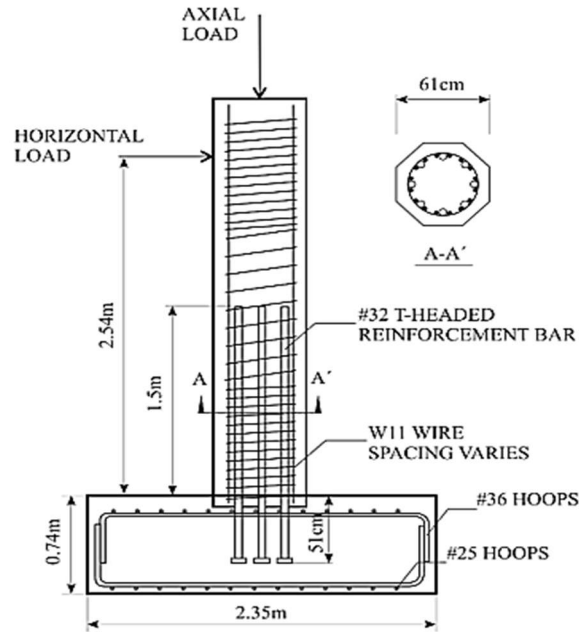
Pile to deck connection specimen setup. (Lehman et al. 2013)
